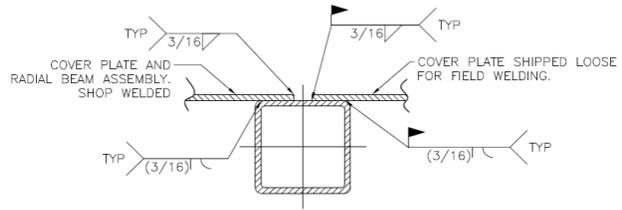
Typical Weld Detail for Radial Beam Connections
